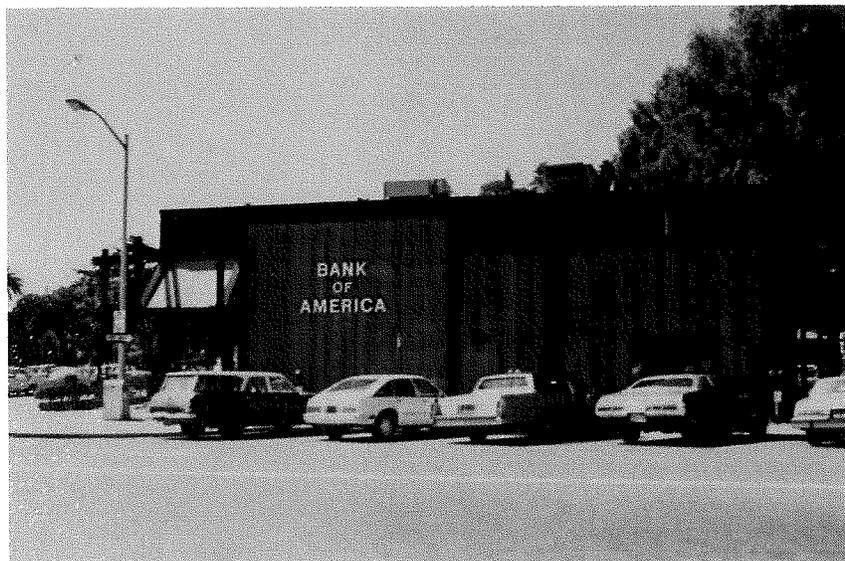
750 Bridgeway north façade after 1972 alterations.
